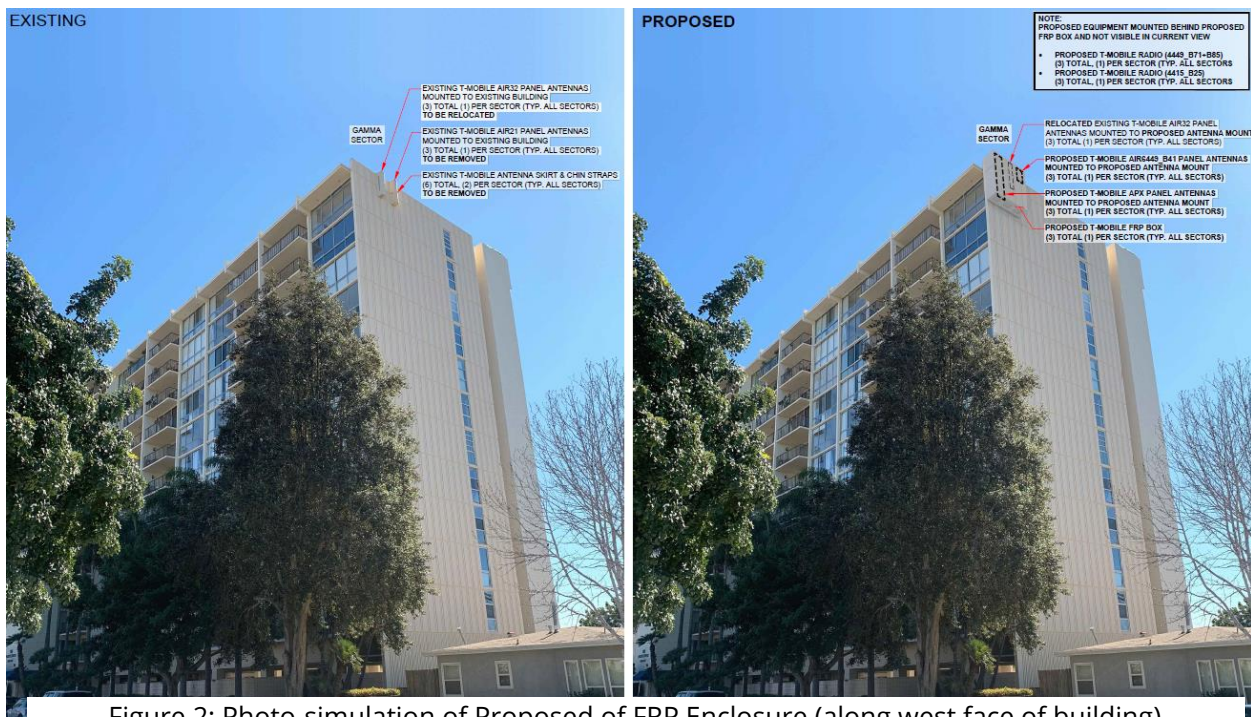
Photo-simulation of Proposed of FRP Enclosure (along west face of building)
